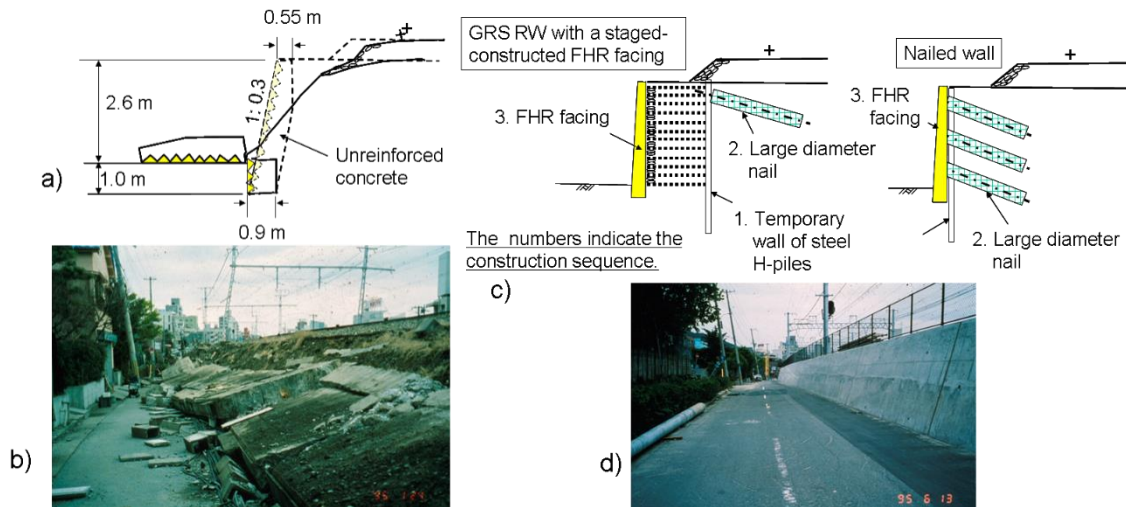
Leaning type RW of unreinforced concrete without a pile foundation between Setsu-motoyama and Sumiyoshi stations that collapsed during the 1995 Great Kobe Earthquake (Tatsuoka et al., 1997a & b); a) cross-section; and b) view of the collapsed wall; and c) cross-section; and d) view after restoration.
